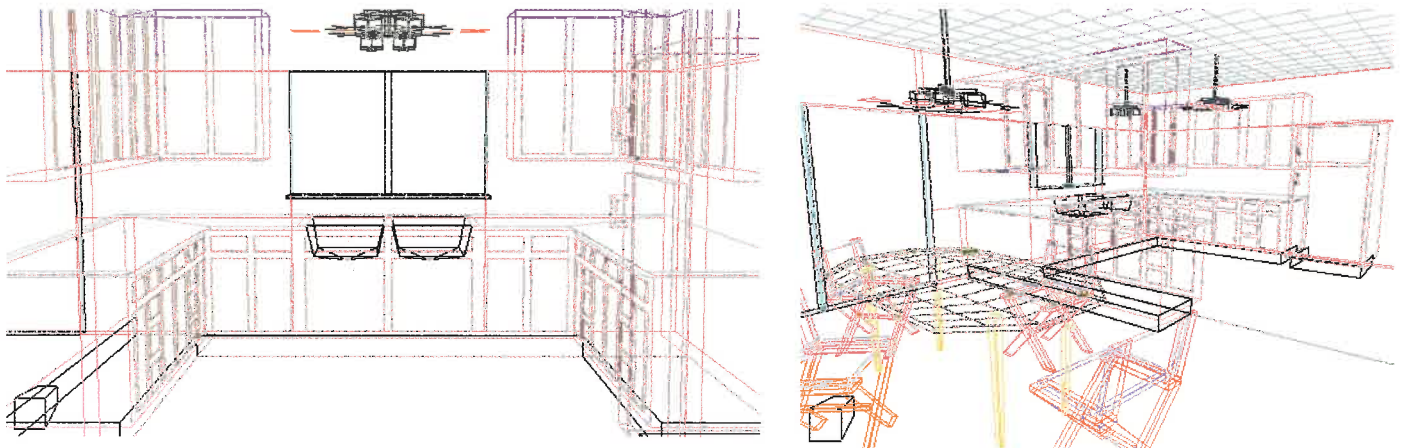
Computer-generated perspective drawings and three-dimensional room elevations. Left—The one-point perspective view shows a kitchen and cabinetry elevation. Right—The two-point perspective view shows a kitchen and dining area. (Autodesk, Inc.)
